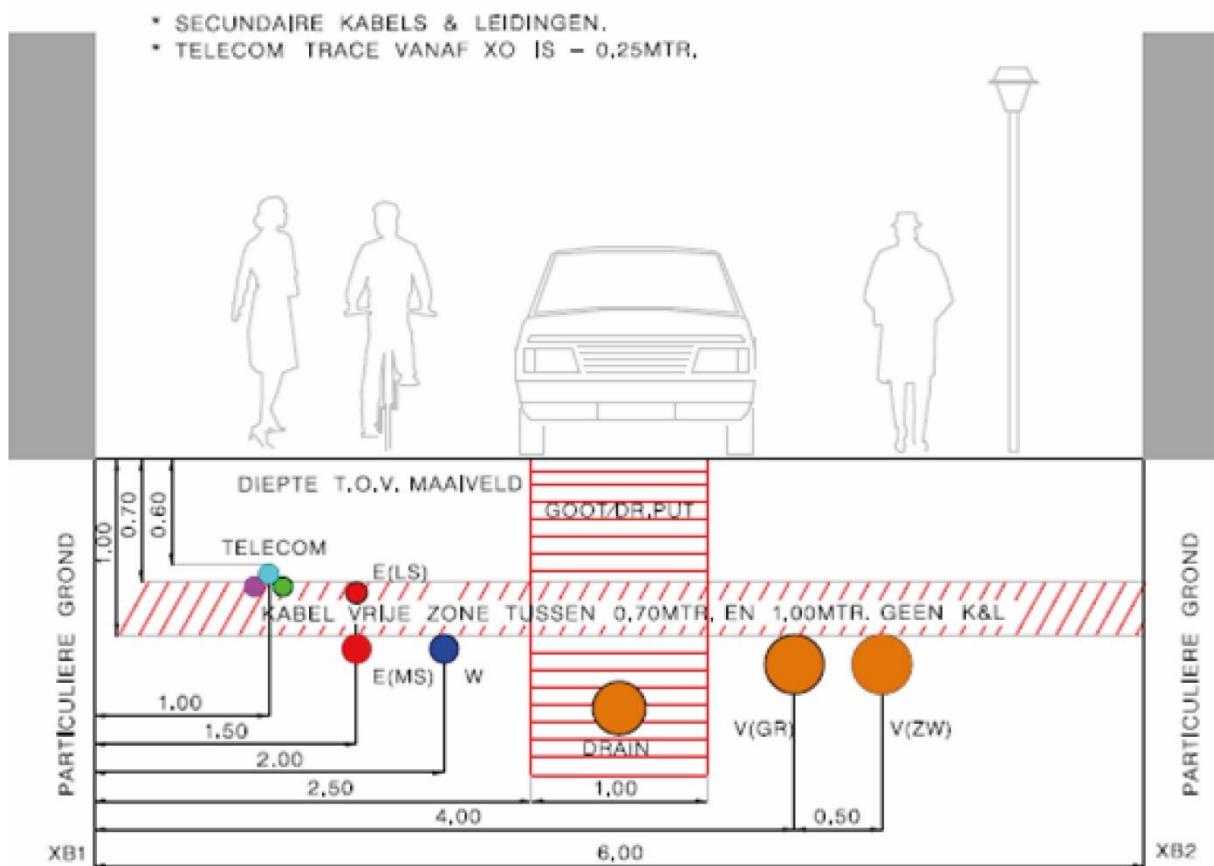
Basic lay out of the street profile for a typical street on the Floriade terrain
